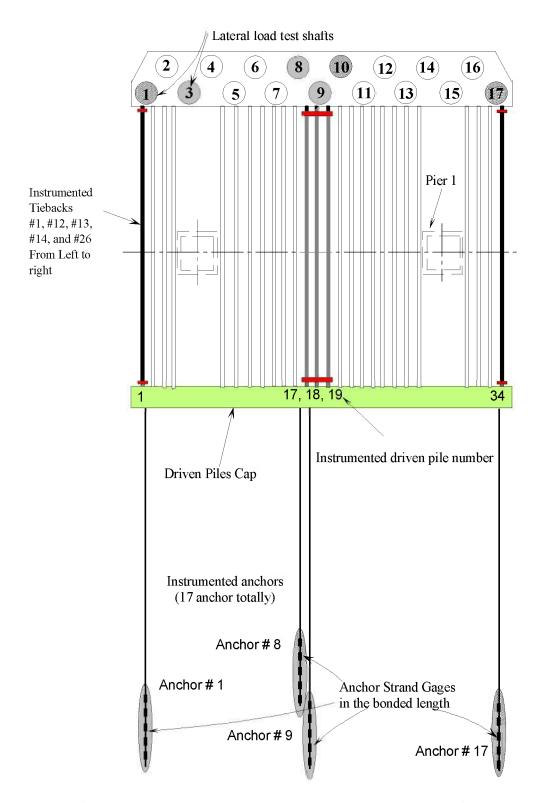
Plan view of the stabilization structure and instrumentation layout
